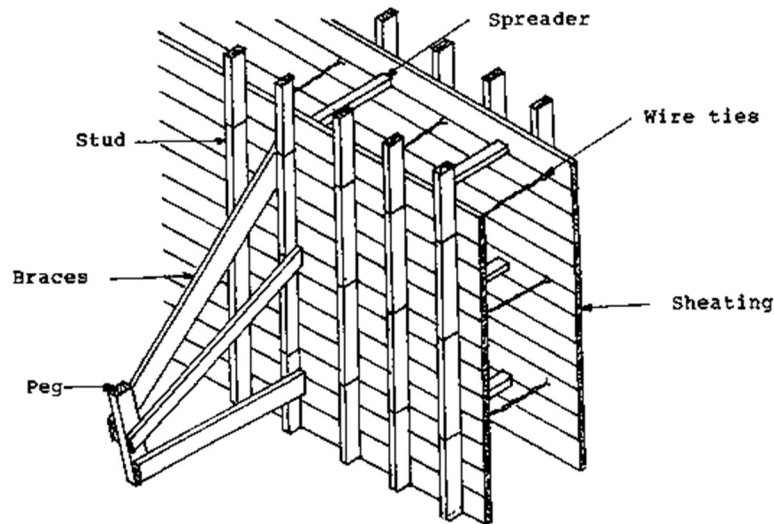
A timber wall formwork system (Source: <https://theconstructor.org/building/formwork-shuttering-types-walls-columns-footings-slabs/11076/>)
